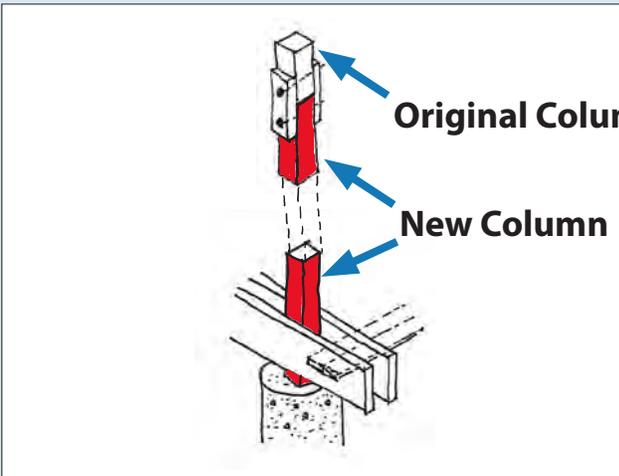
When replacing a missing column, make sure the new column has a strong foundation and that it is securely attached to the existing piece of column.
